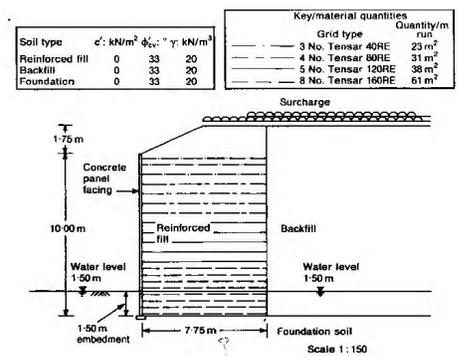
Cross-section of the geosynthetic-reinforced retaining wall on the Mumbai-Pune Expressway (Parvel Bypass-Package I) (courtesy of Netlon India, India, 2001)
